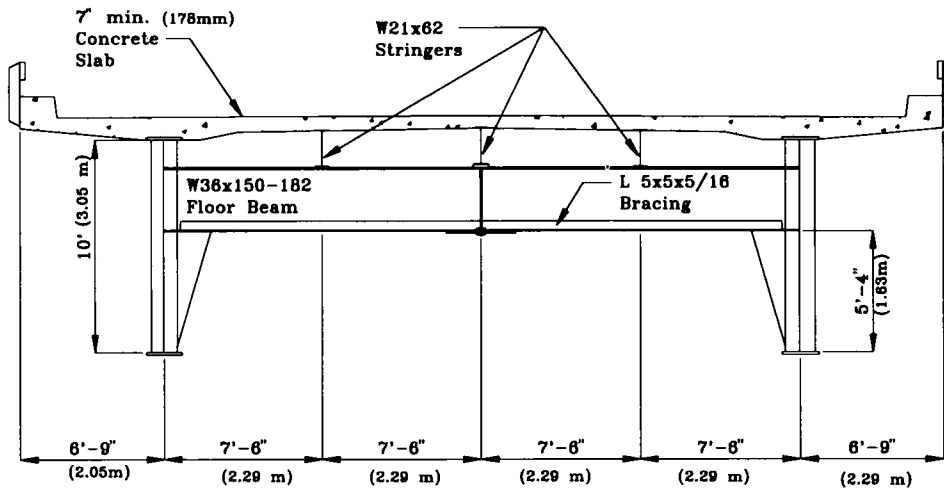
Cross section of I-40 bridge at floor beam location.
